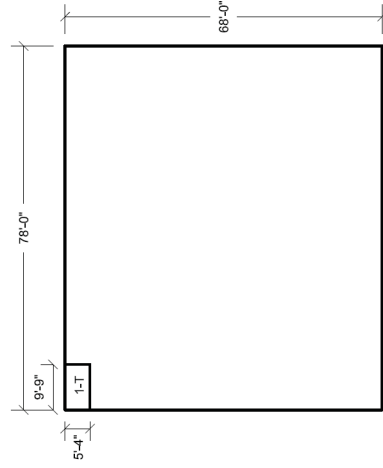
H.6-78A: PUMP HOUSE INTERNAL WEST WALL LOOKING WEST
